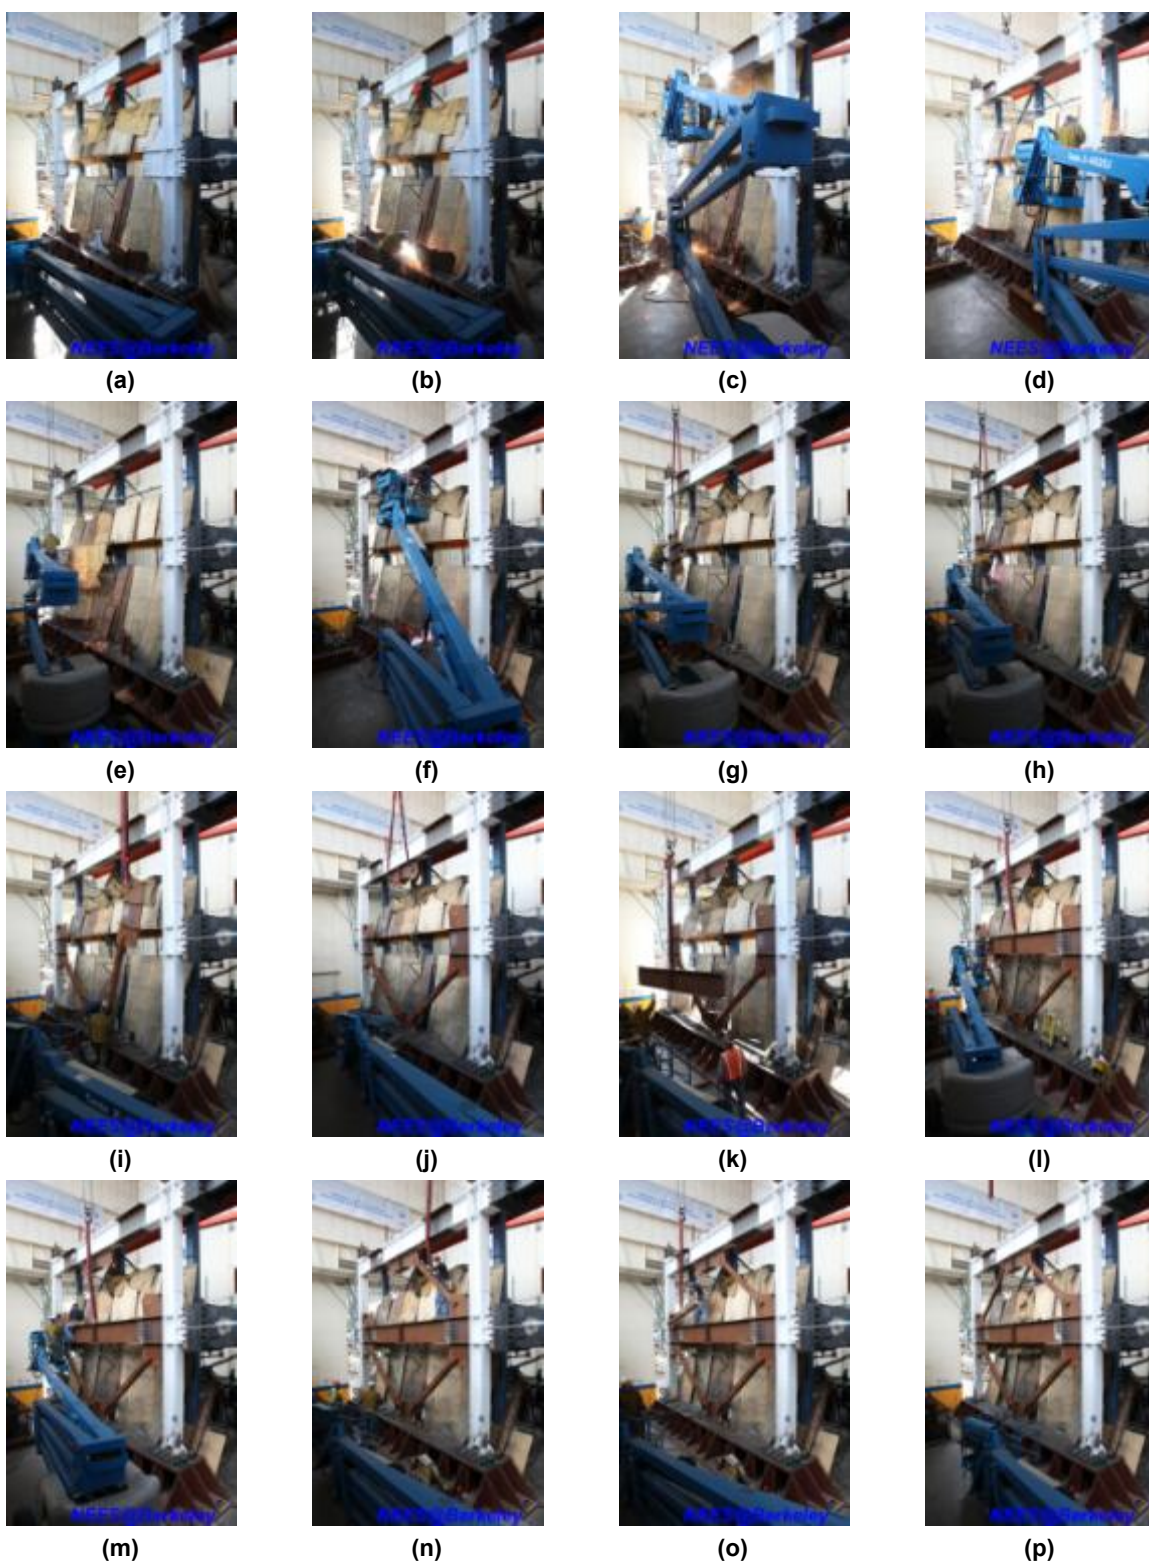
Specimen TCBF-B-4: key construction steps.
